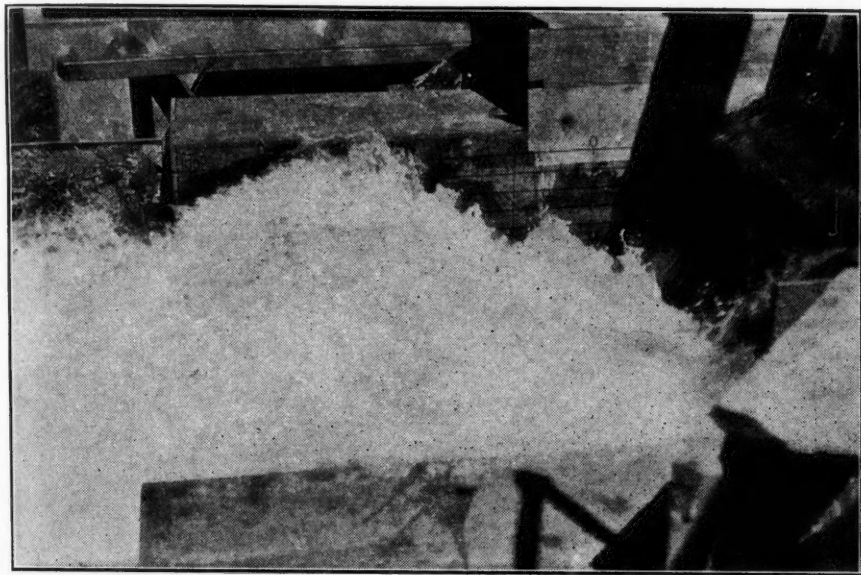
PIT NO. 4 TEST DAM: EXPERIMENT NO. 1. STILLING POOL WITH BUCKET. GAUGE HEIGHT PROPORTIONAL TO 27 FEET 6 INCHES ON ACTUAL DAM.
